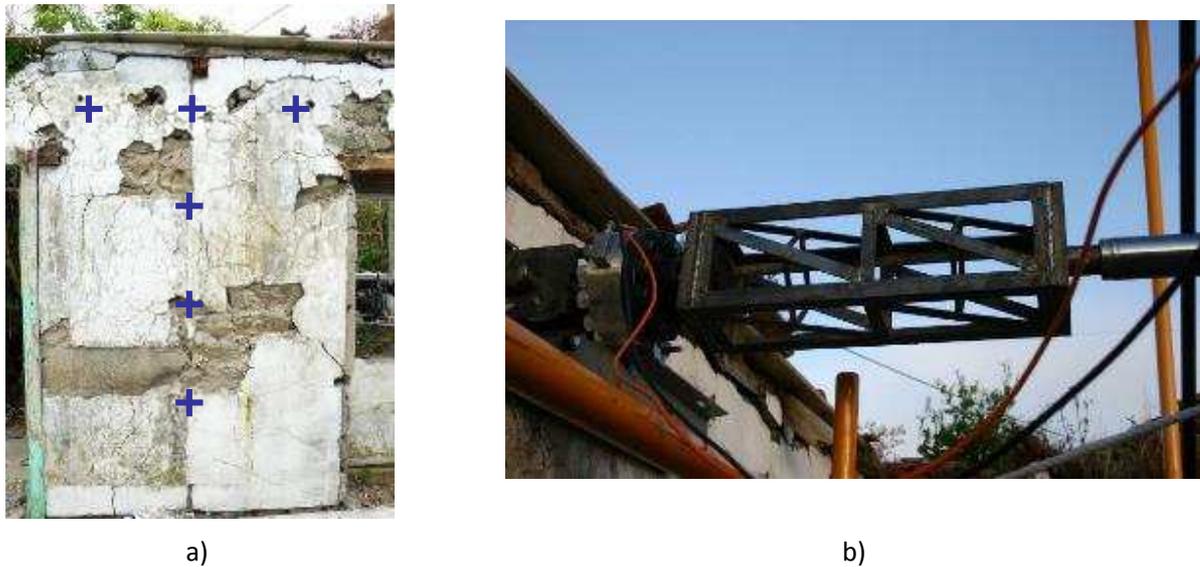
Measurement details: a) layout of displacement measurement; b) load cell.
